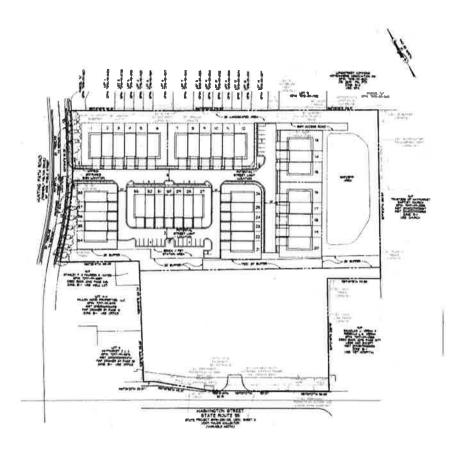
Site Concept Plan (Source: The Engineering Groupe, excerpted by Pennoni)
